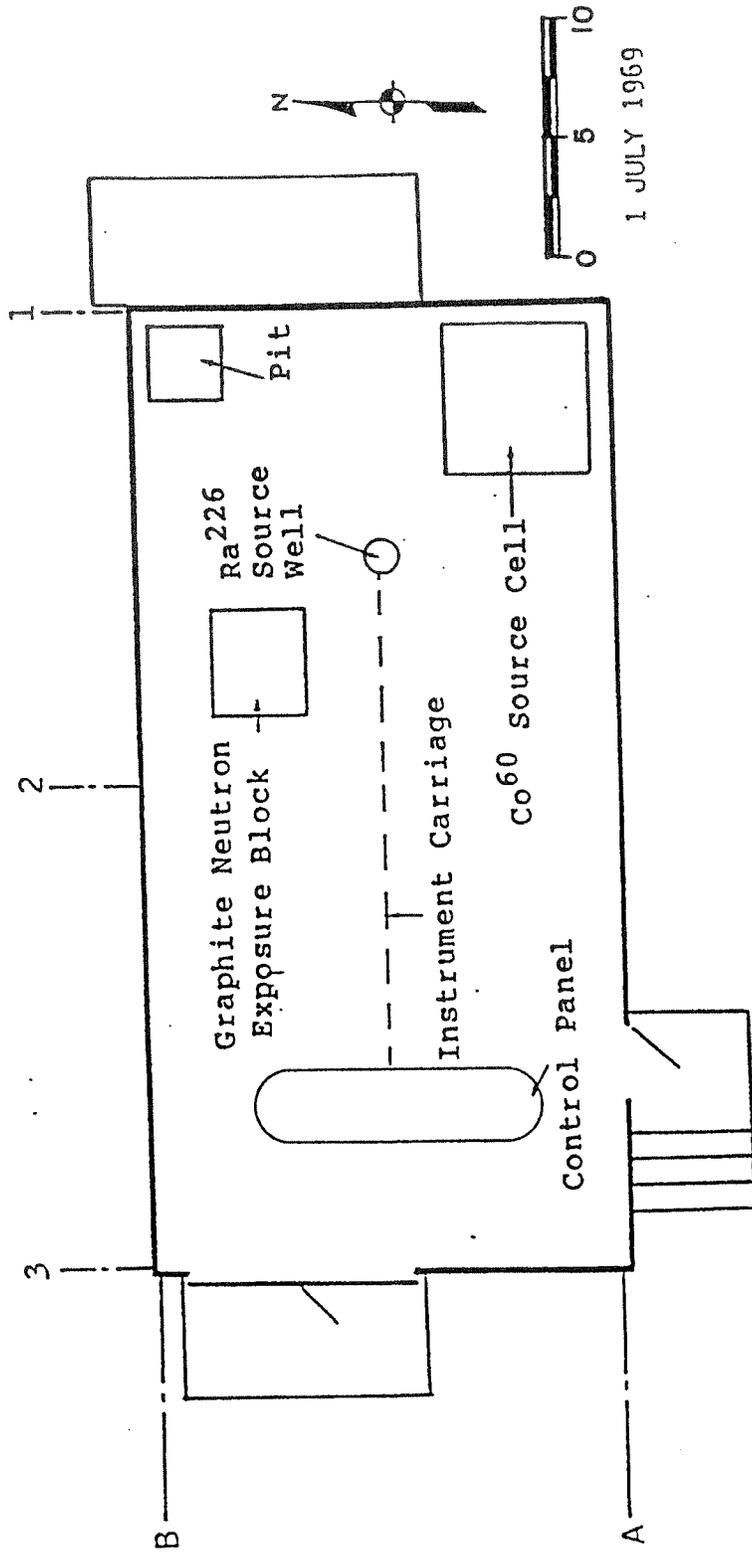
Plot Plan of the Radiation Measurements Facility, Building T029
